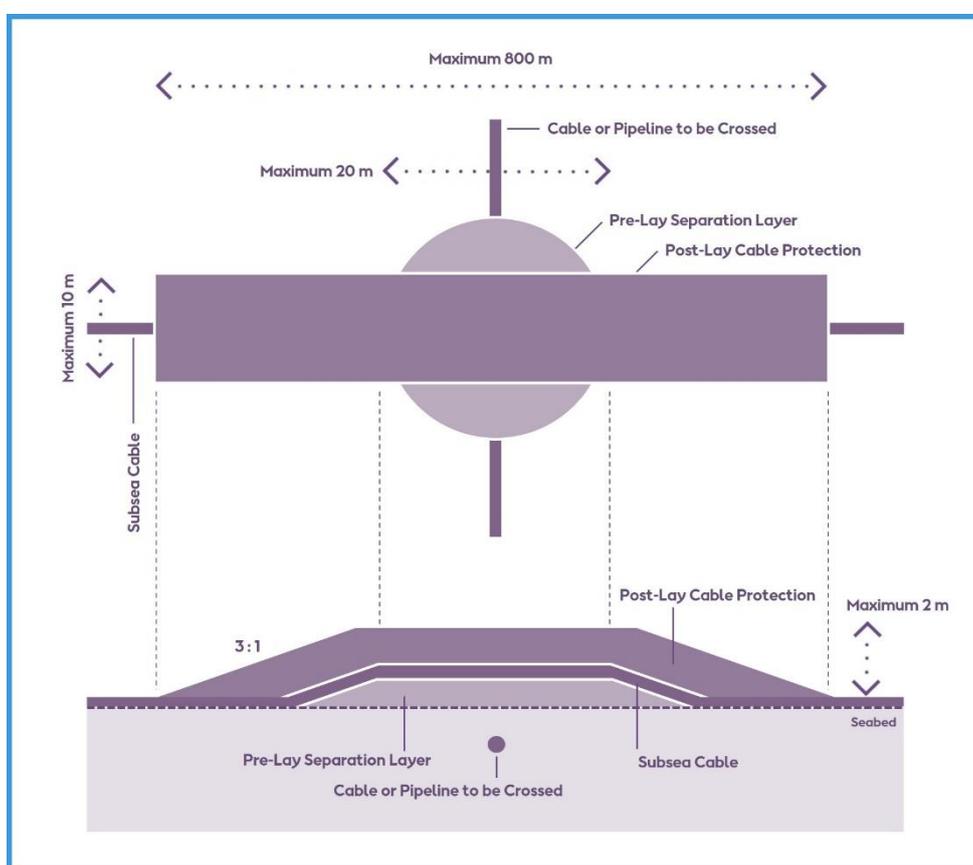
Indicative Cable Crossing Cable Protection Arrangement
